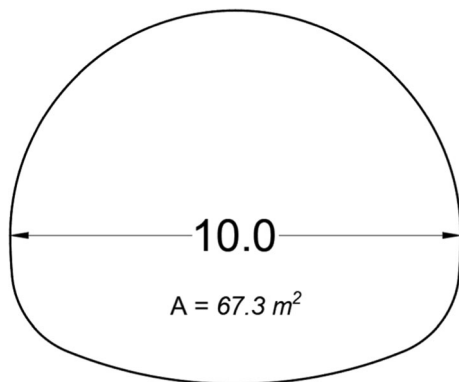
Cross-section of the oval-shaped tunnel used in the finite element analyses. Width $D = 10 \text{ m}$, section area $A = 67.3 \text{ m}^2$
